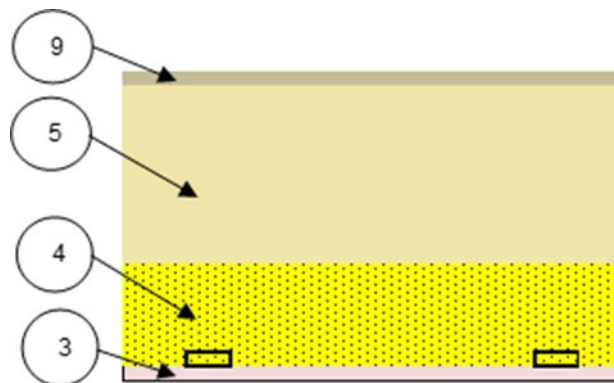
Massive timber floor ceiling system with fire grade lining fixed to furring channels that are suspended or clip fixed to the massive timber – Section view
